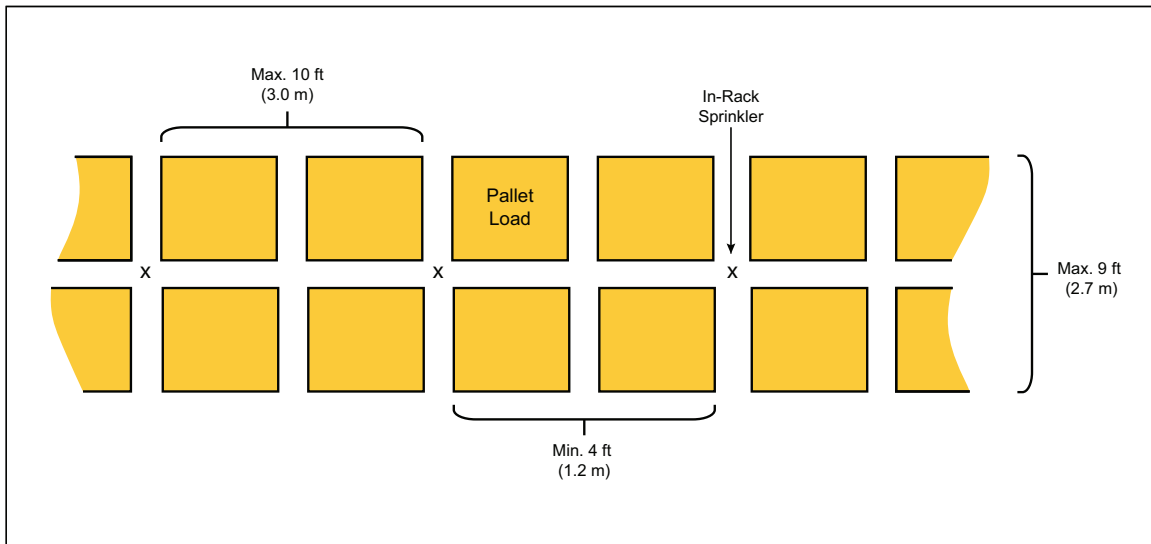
Plan view of IRAS(EO) horizontal in-rack sprinkler arrangement for double-row racks up to 9 ft (2.7 m) deep
